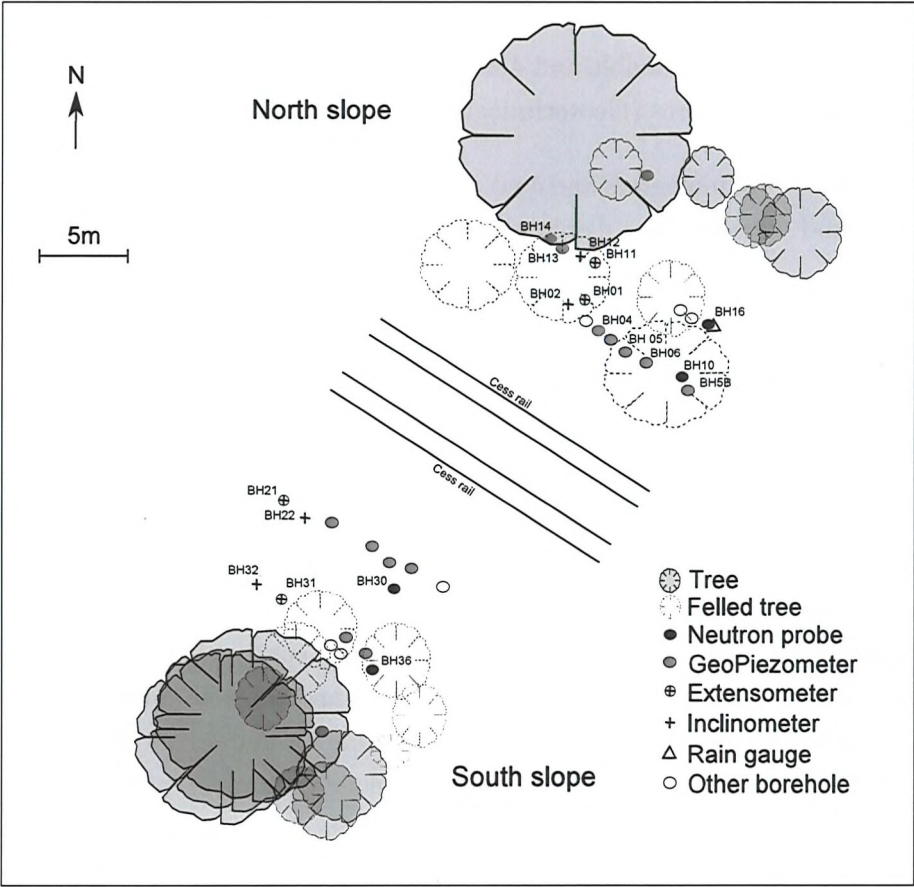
Hawkwell embankment tree plan. (Redrawn from Arup (2007))
